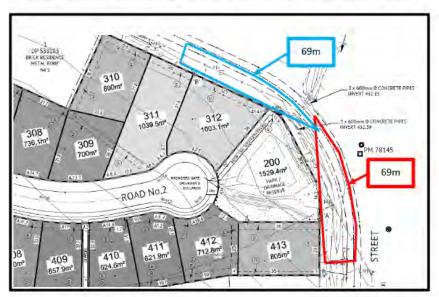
SIGHT DISTANCE REVIEW OF THE RAILWAY STREET/ HOME STREET BEND
